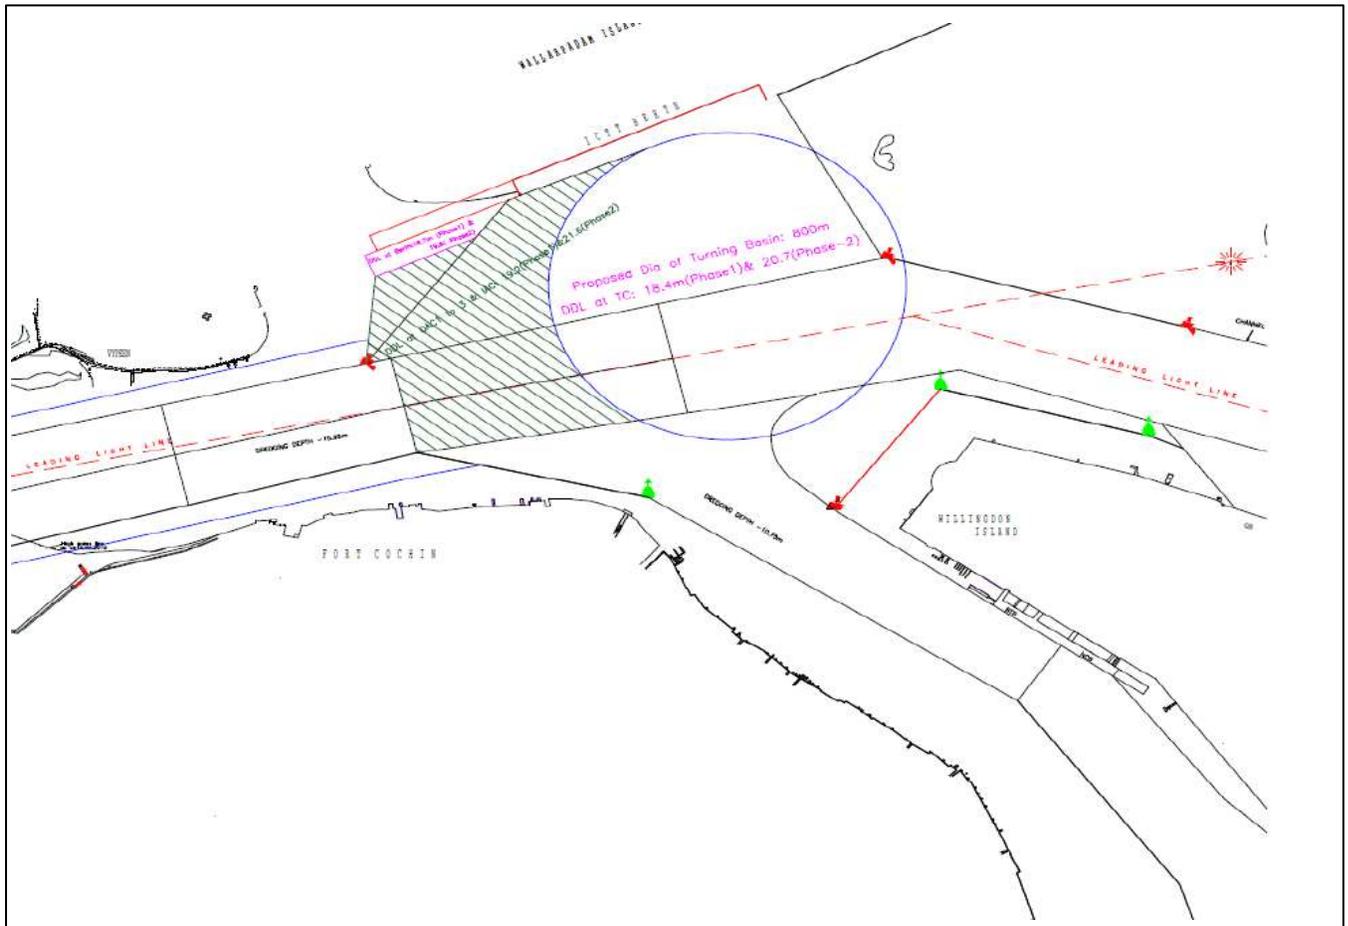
Typical arrangement of dredging area connecting new Berth basin to channel
